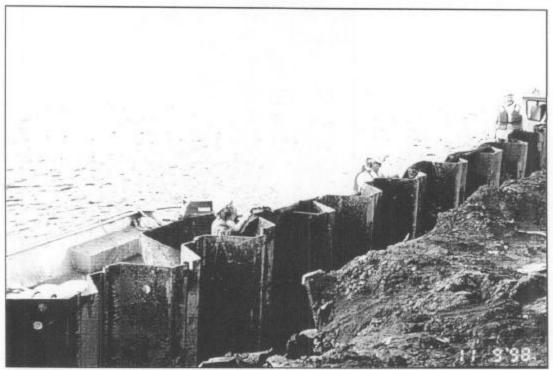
Clamping Geotextile Fabric End to Sheet Pile Wall
